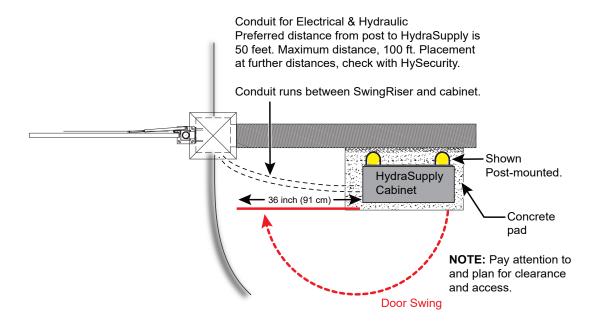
HydraSupply Installation Overview Top Electrical and Hydraulic Conduits
